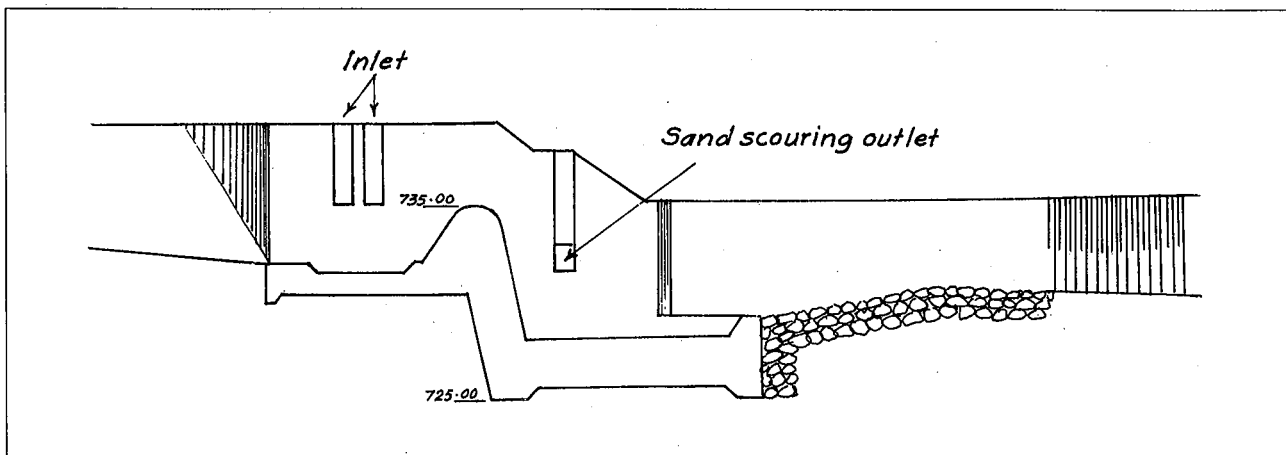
Reinforced concrete weir that replaced a masonry weir destroyed by a flood, Bali, Indonesia.
